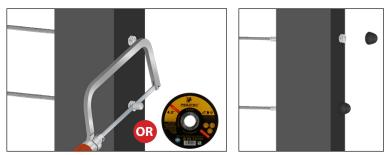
Cut the remaining shank flush with the lock nut, then place the cover nut over the assembly.
